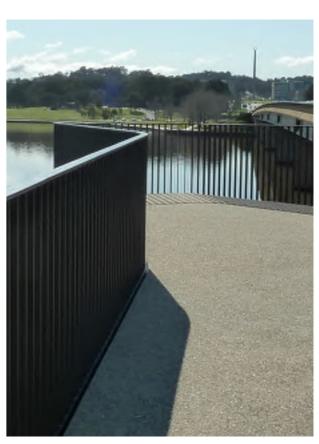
Proposed viewing platform balustrade similar to existing in Bowen Place lookout
